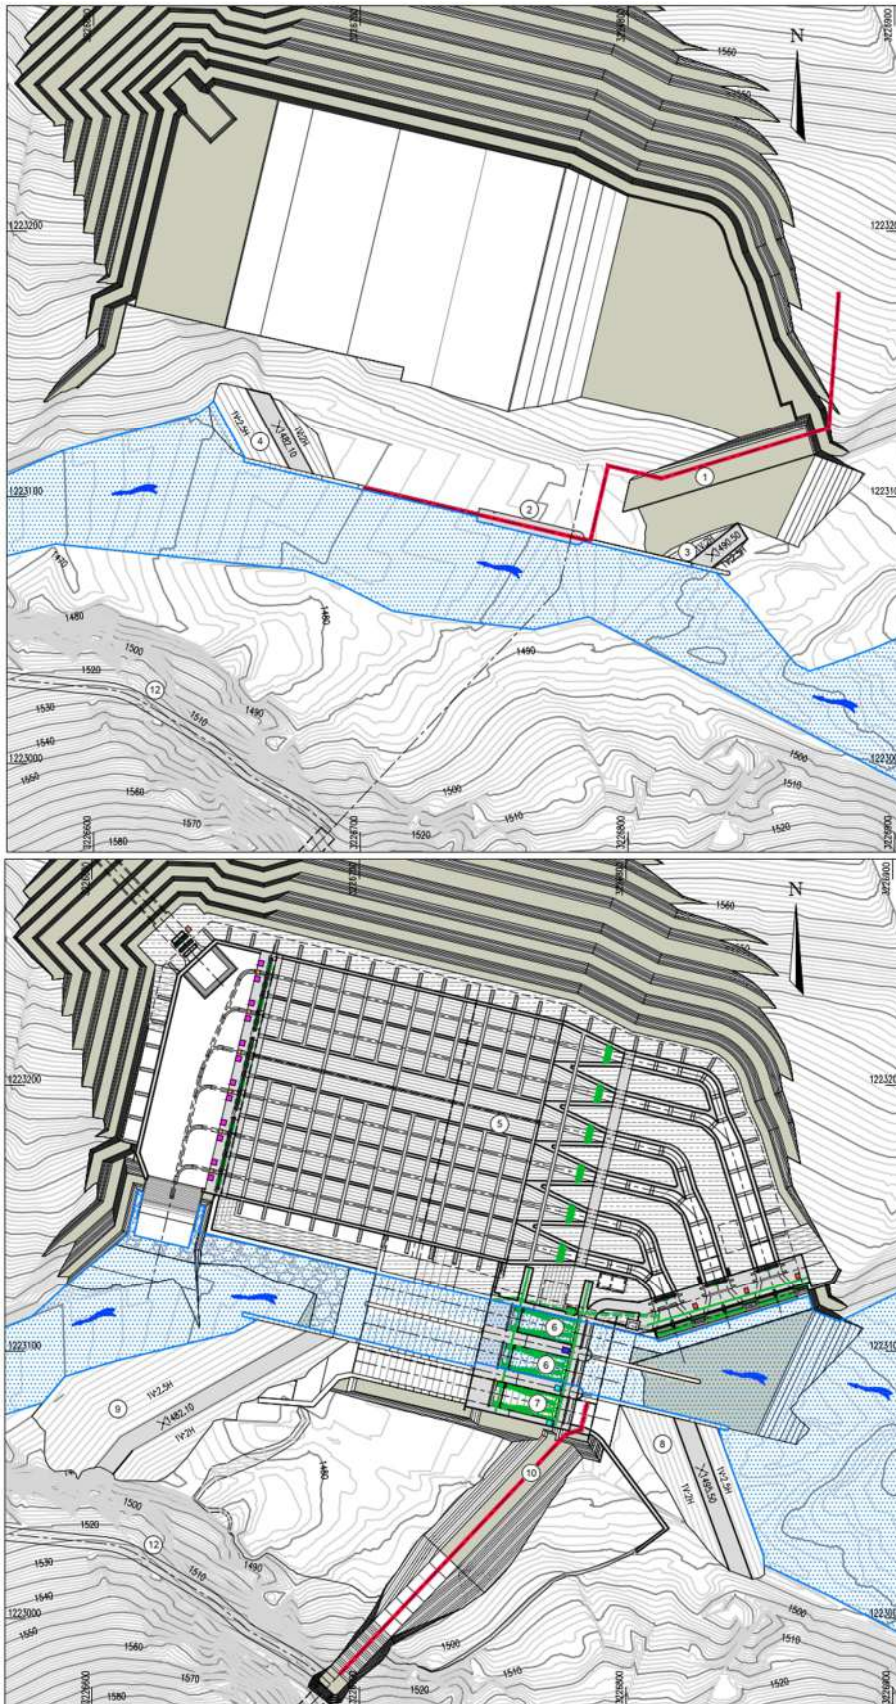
Lower Spat Gah Headworks river diversion concept
